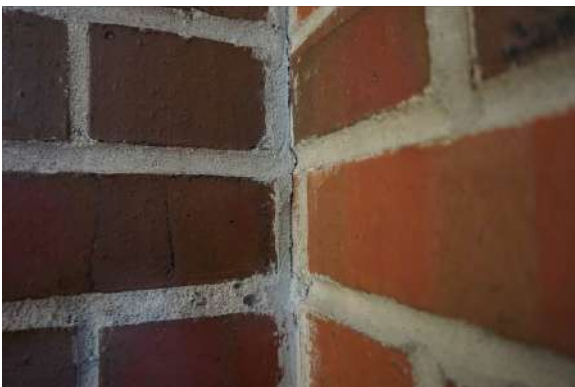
Discontinuous separation at interface of concrete stair/masonry wall at southeast corner of gymnasium
